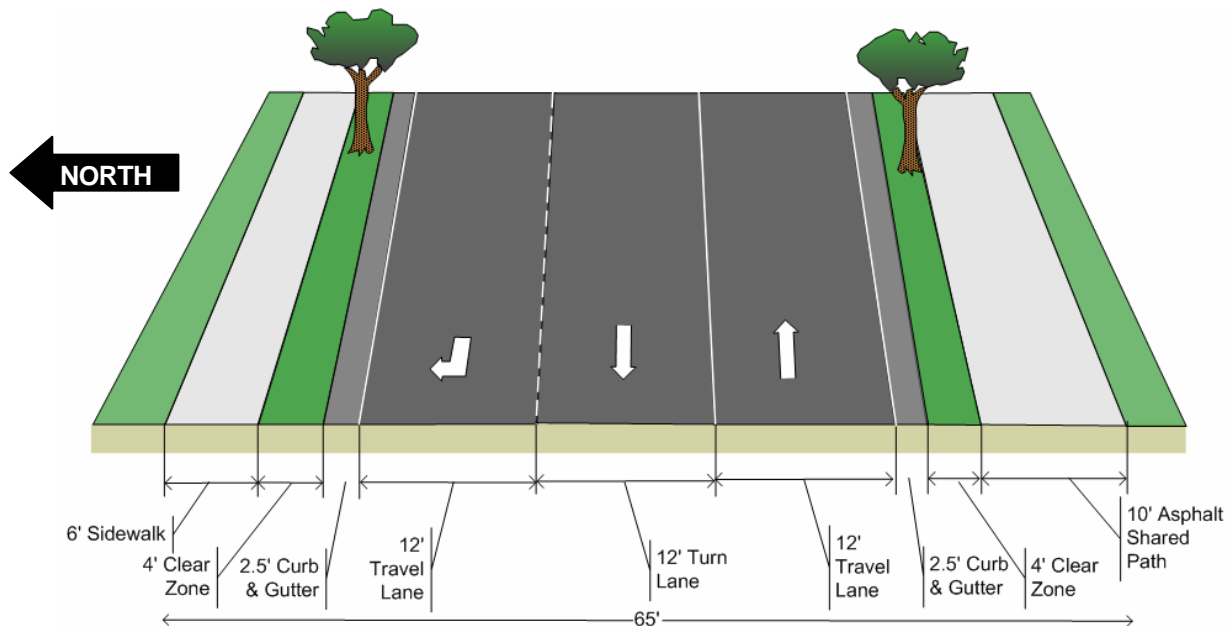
Recommended Typical Section with Outside Turn Lane
